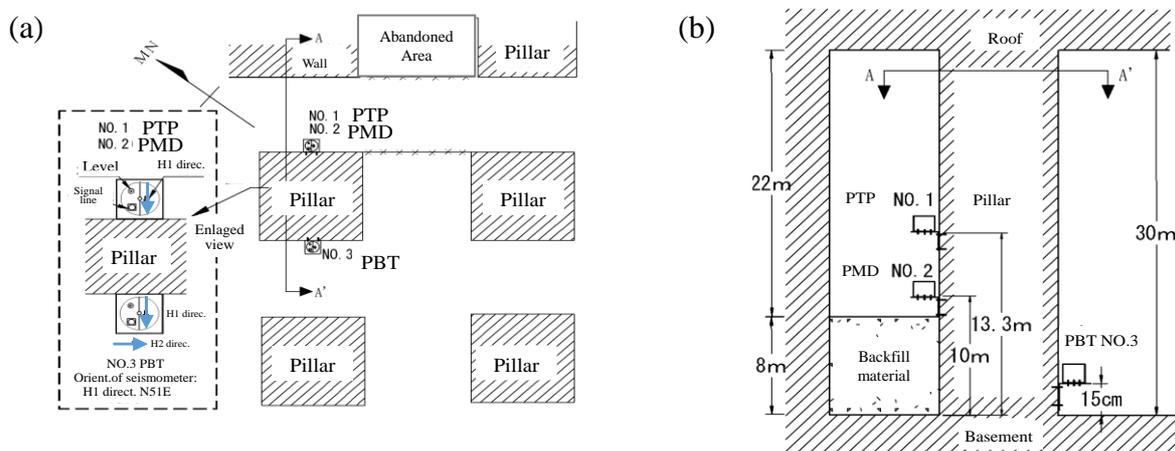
Layout of underground quarry and locations of instruments, (a) plan view, (b) side elevation view.
